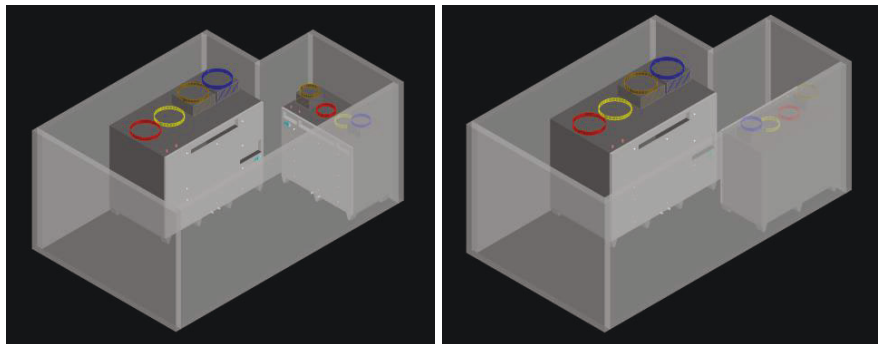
Designed arrangement of air handling units on the left (2a) and installed arrangement on the right (2b).
